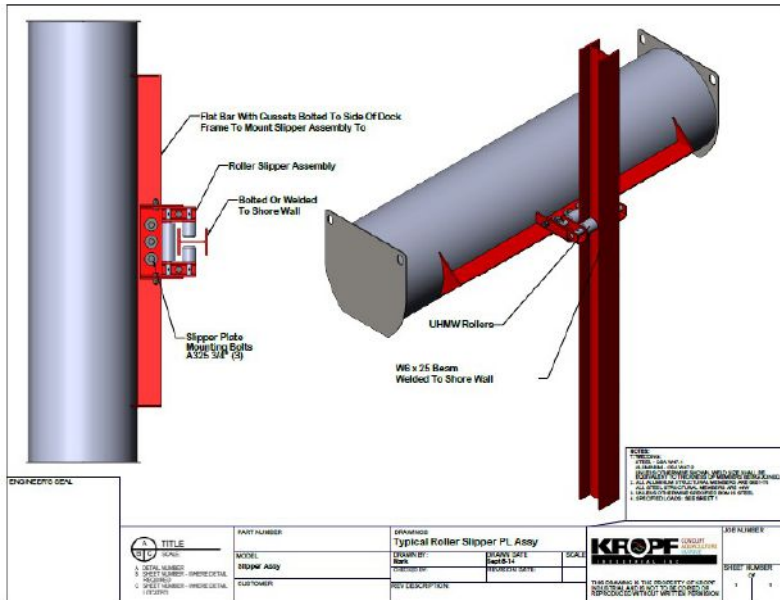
Typical Floating Dock Connection to Steel Sheet Pile Wall Detail
